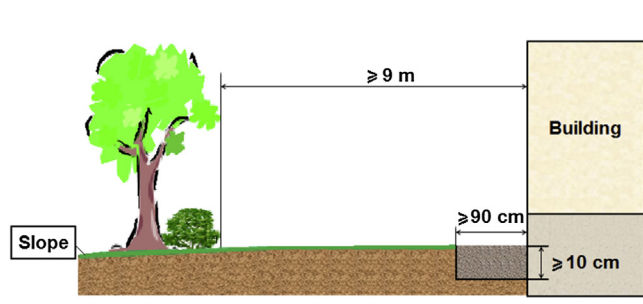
The site should have a path or pebbled gravel strip around the factory that is at least 90 cm wide and 10 cm deep, and trees should be located at least 9 m from buildings. To exclude flooding and the entry of rodents, factories should be built at a higher level to the ground outside, and there must be provided in proper drainage away from the building structures (Holah et al., 2014).
